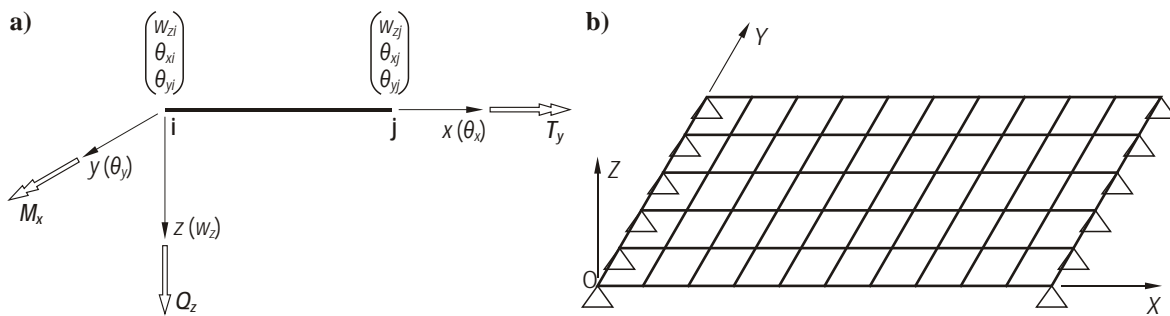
Grillage model: a) a single grillage element, b) grillage model of a bridge span [21]
